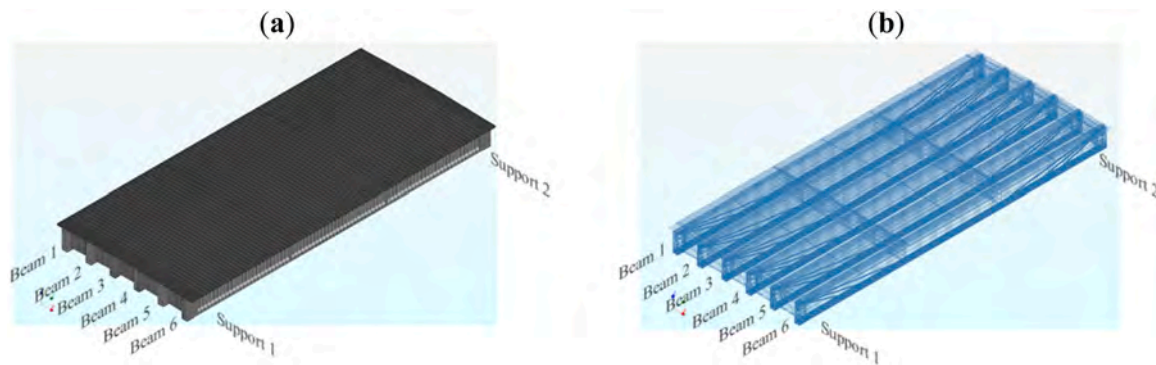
3D FE model with annotation of the beams: (a) concrete elements, (b) reinforcement elements.
